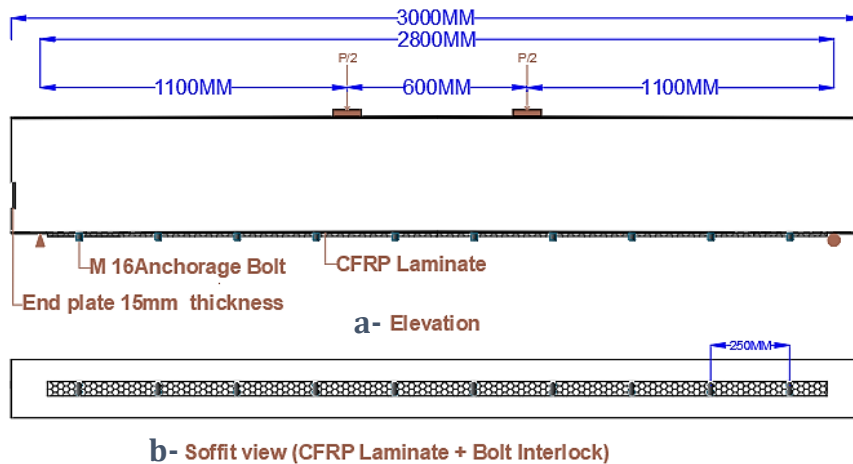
Laminate and mechanical bolts anchorage, a- elevation b- soffit view
